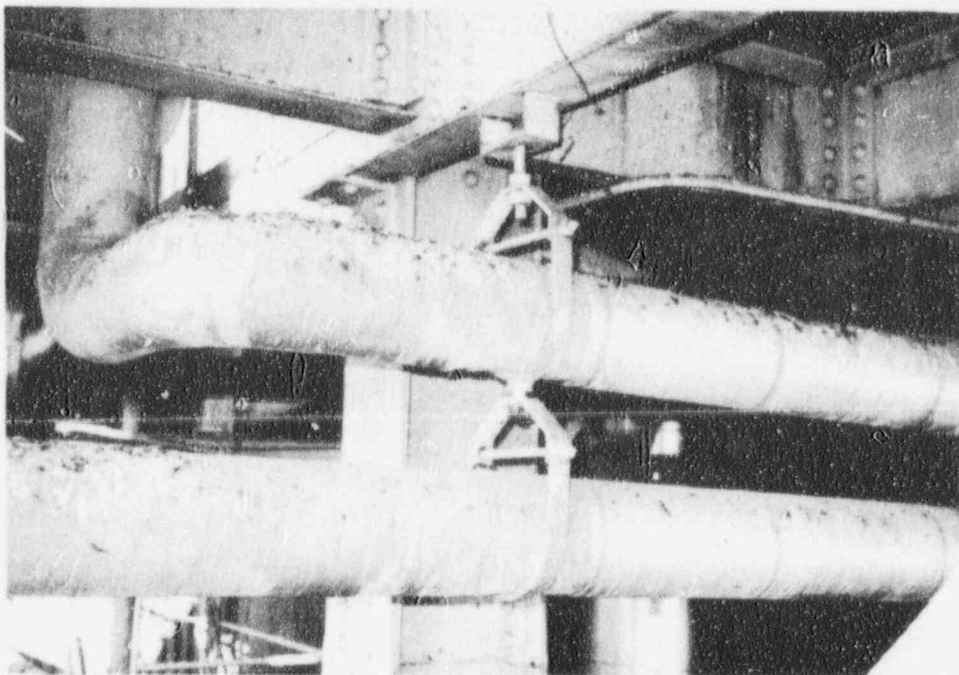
Pipe Supporting Pipe in Kern Unit 1
